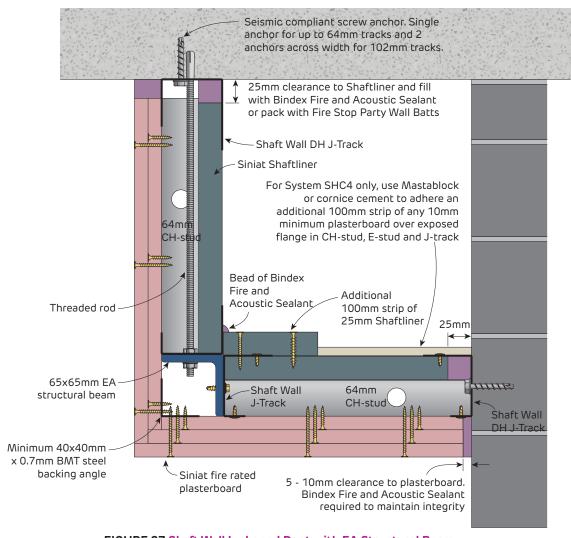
Shaft Wall L-shaped Duct with EA Structural Beam SHW2 and SHC4 Section
